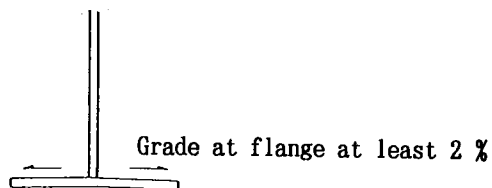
Grade at flange to prevent water-traps¹⁴⁾⁻¹⁷⁾
